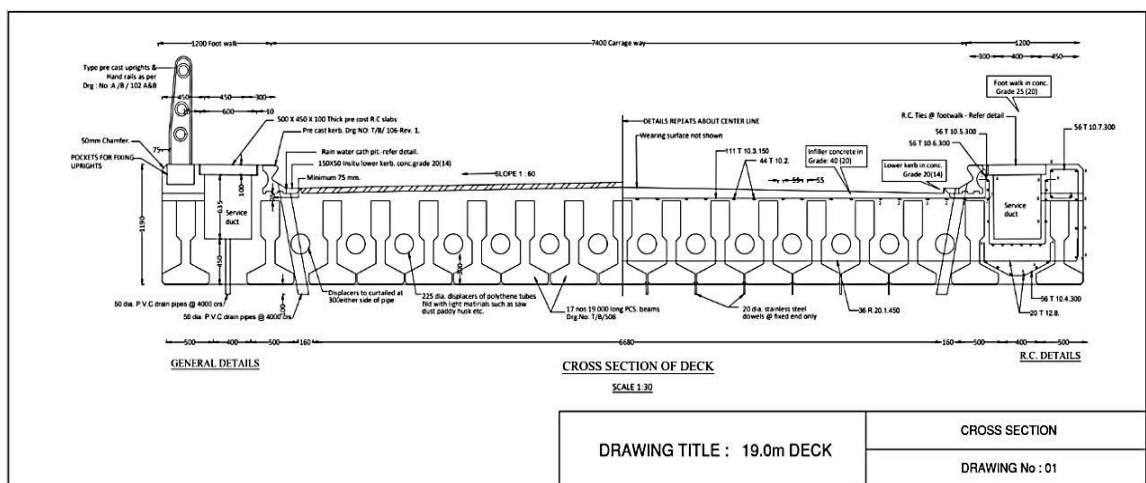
Two lane voided slab-deck 19.0m (largest length) cross section
